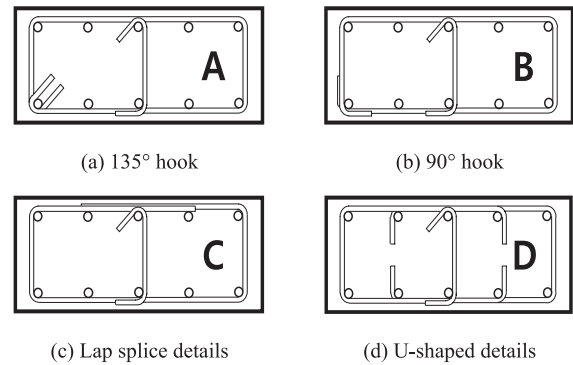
Stirrup Details of Rectangular Columns (Kim et al 2015)
